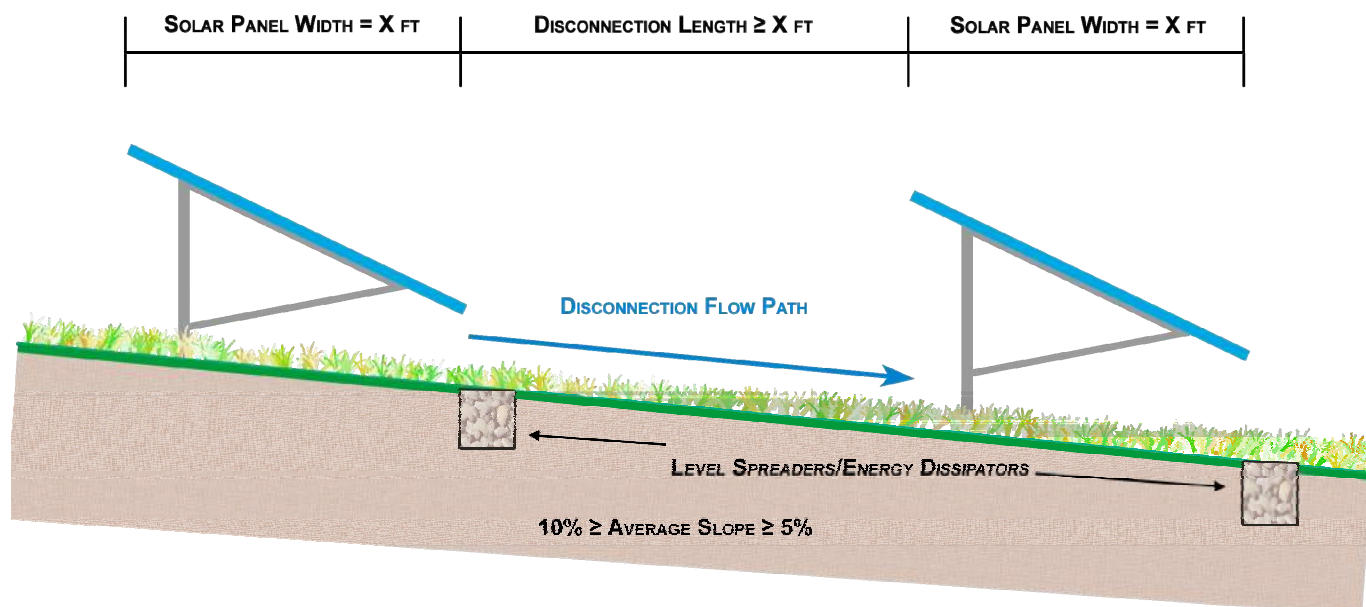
Typical Installation – Slope $\geq 5\%$ but $\leq 10\%$
